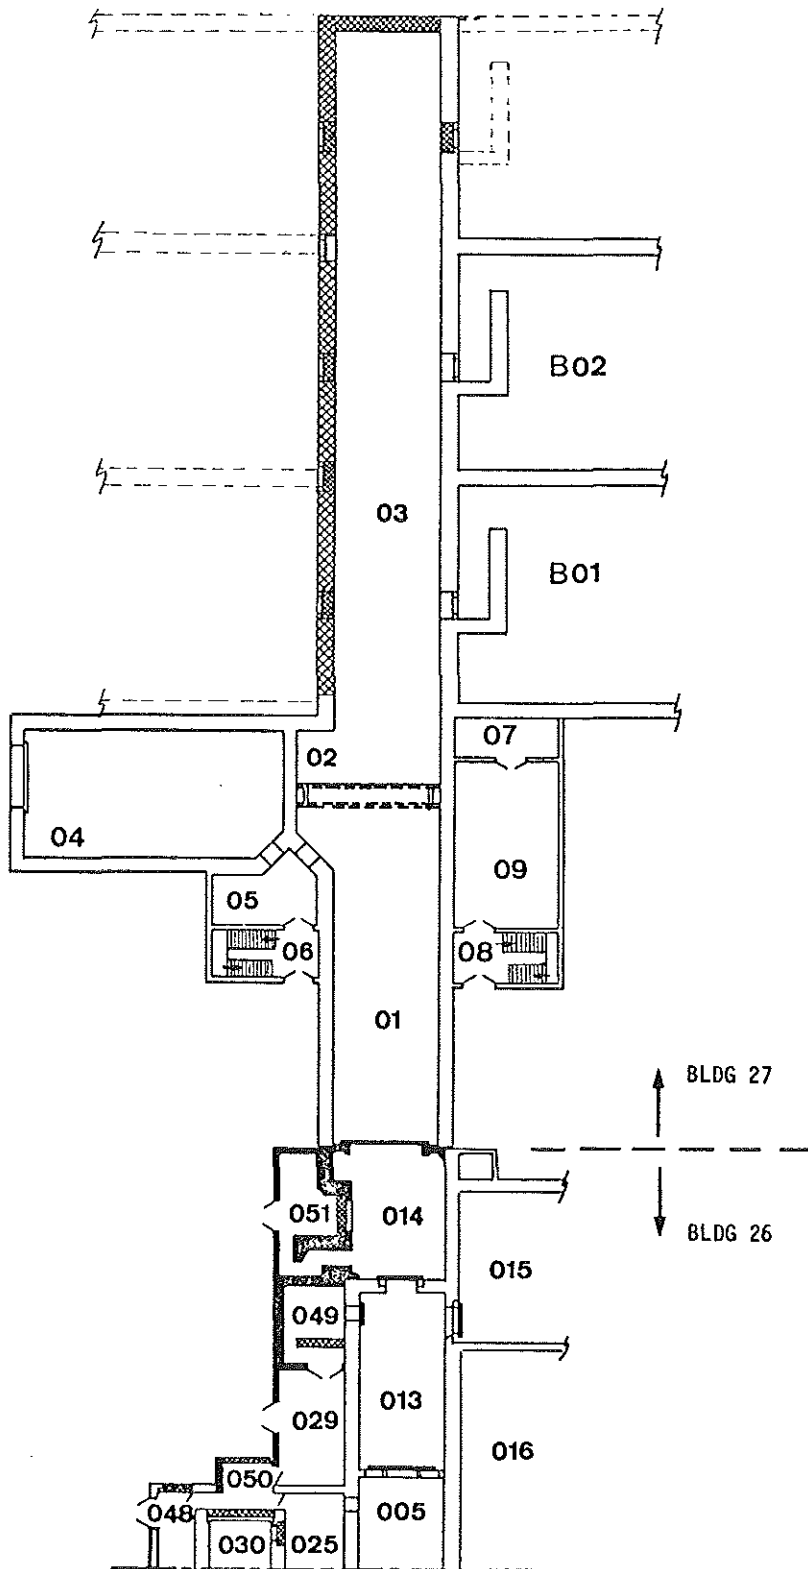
PLAN-VIEW OF BUILDING 27 (Ground floor)
